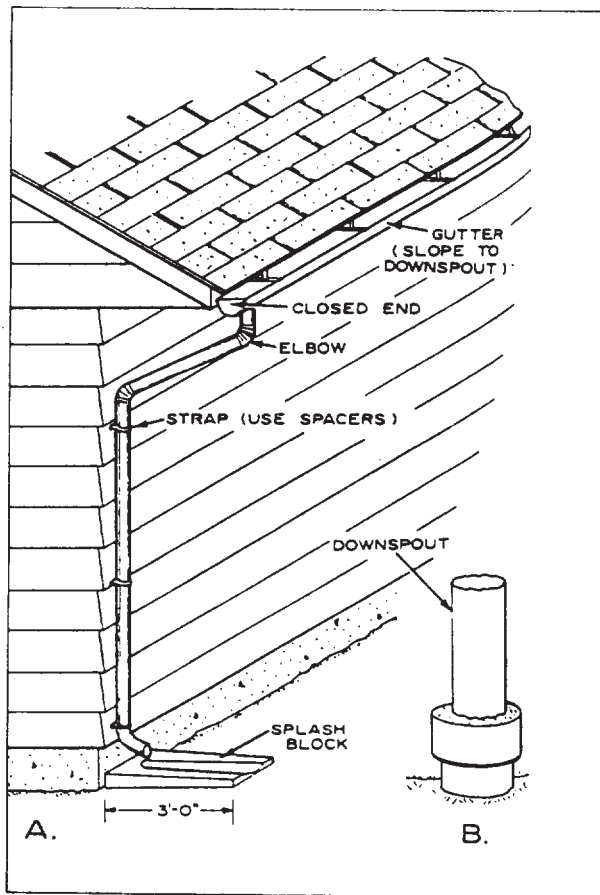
Use of gutter and downspout: A. Downspout with splash block; B. Drain to storm sewer.
